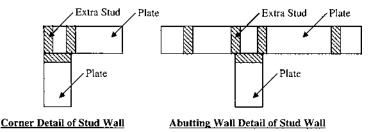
Extra studs placement at wall corner and abutting wall.
